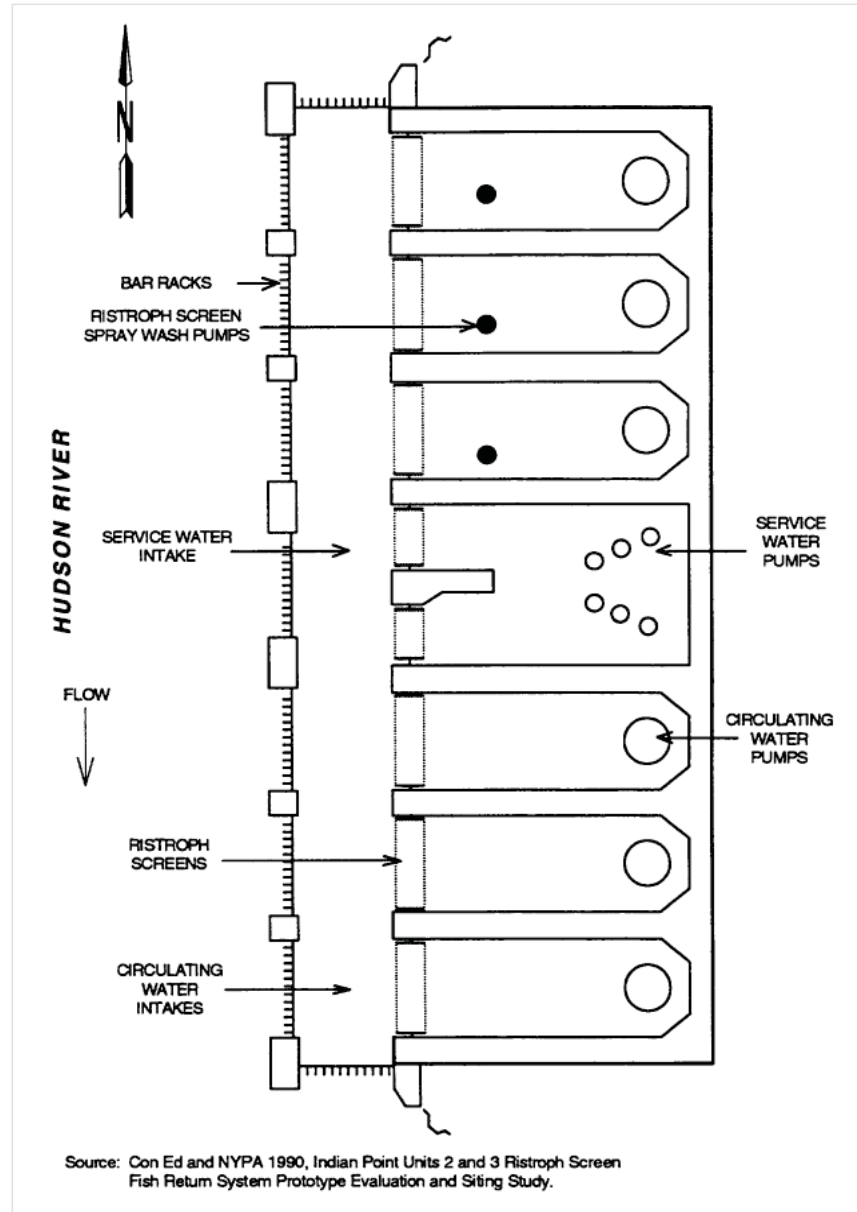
Indian Point Unit 3 (IP3) cooling water intake structure - plan view.
